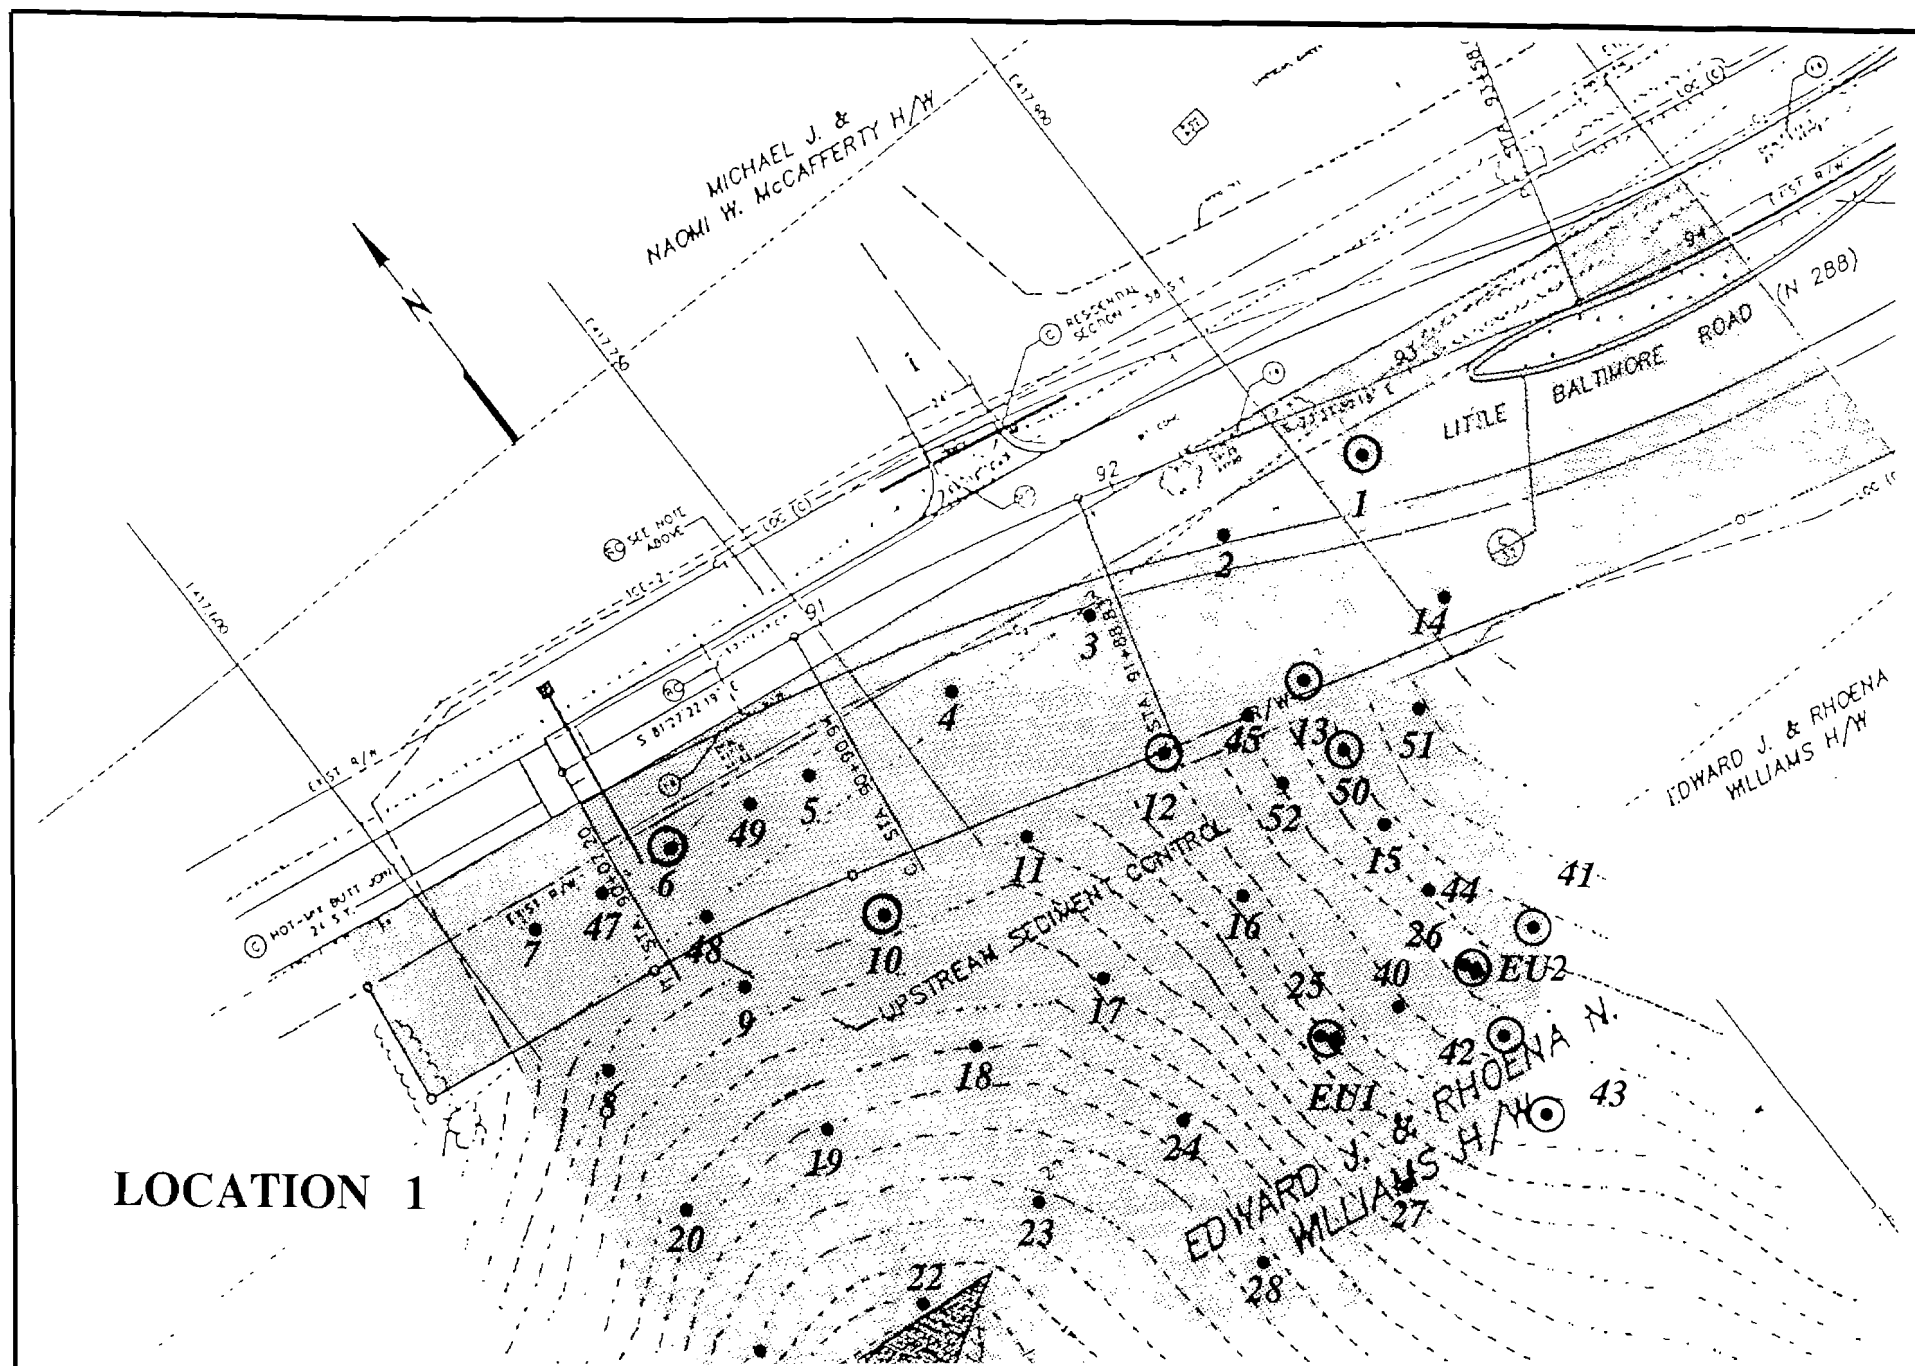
Project Plans Showing Locations of Subsurface Tests in Area 1, Intersection of S.R. 7 and S.R. 72.
